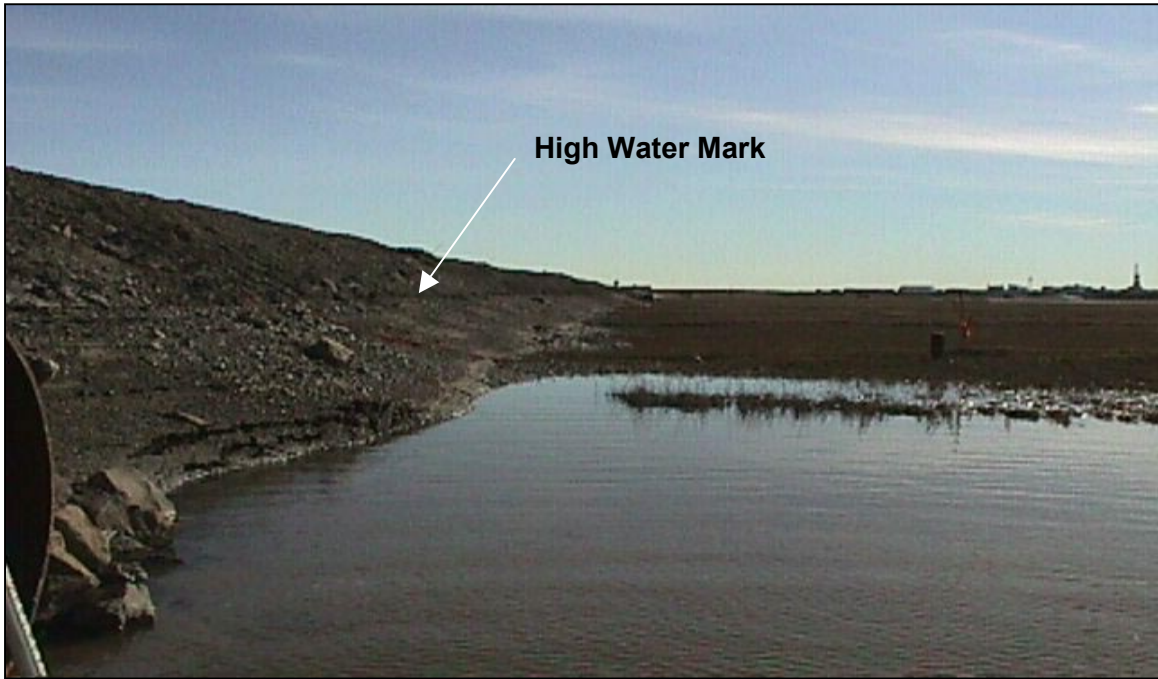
Looking east along the south side of the embankment on the road to CD-2 near culvert CS-5. (6/18/00)
